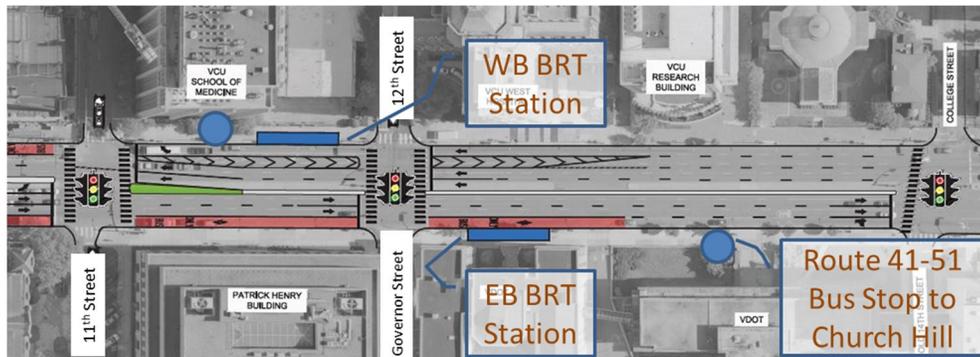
The location of the proposed BRT stations at 12th Street, and existing local bus stops with access to and from Church Hill.
